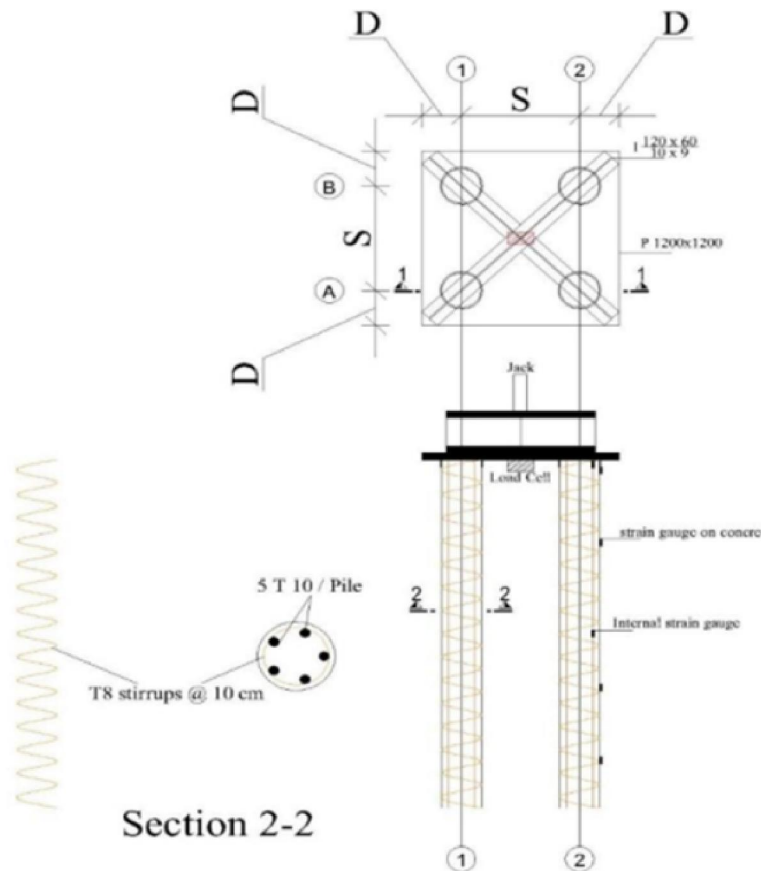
Concrete dimension and reinforcement for four piled-raft foundation model with pile square steel plate (cap)
